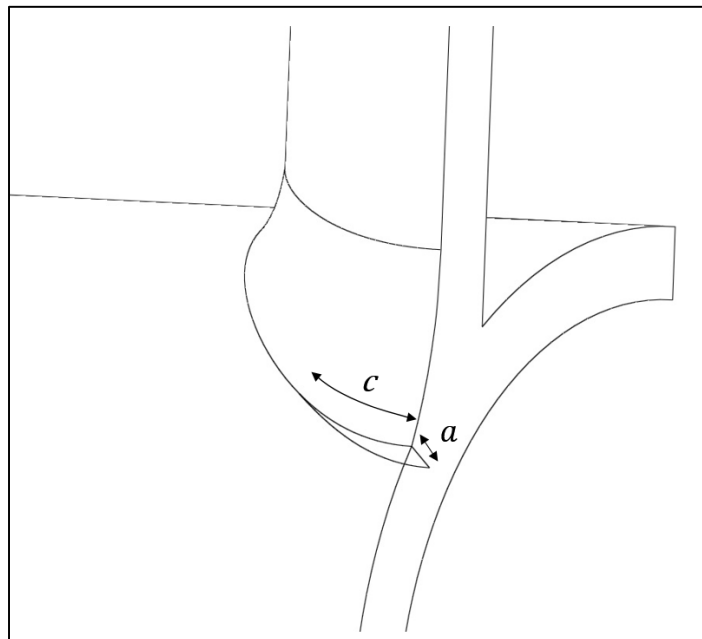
Typical fatigue crack at weld toe of a tubular joint.
